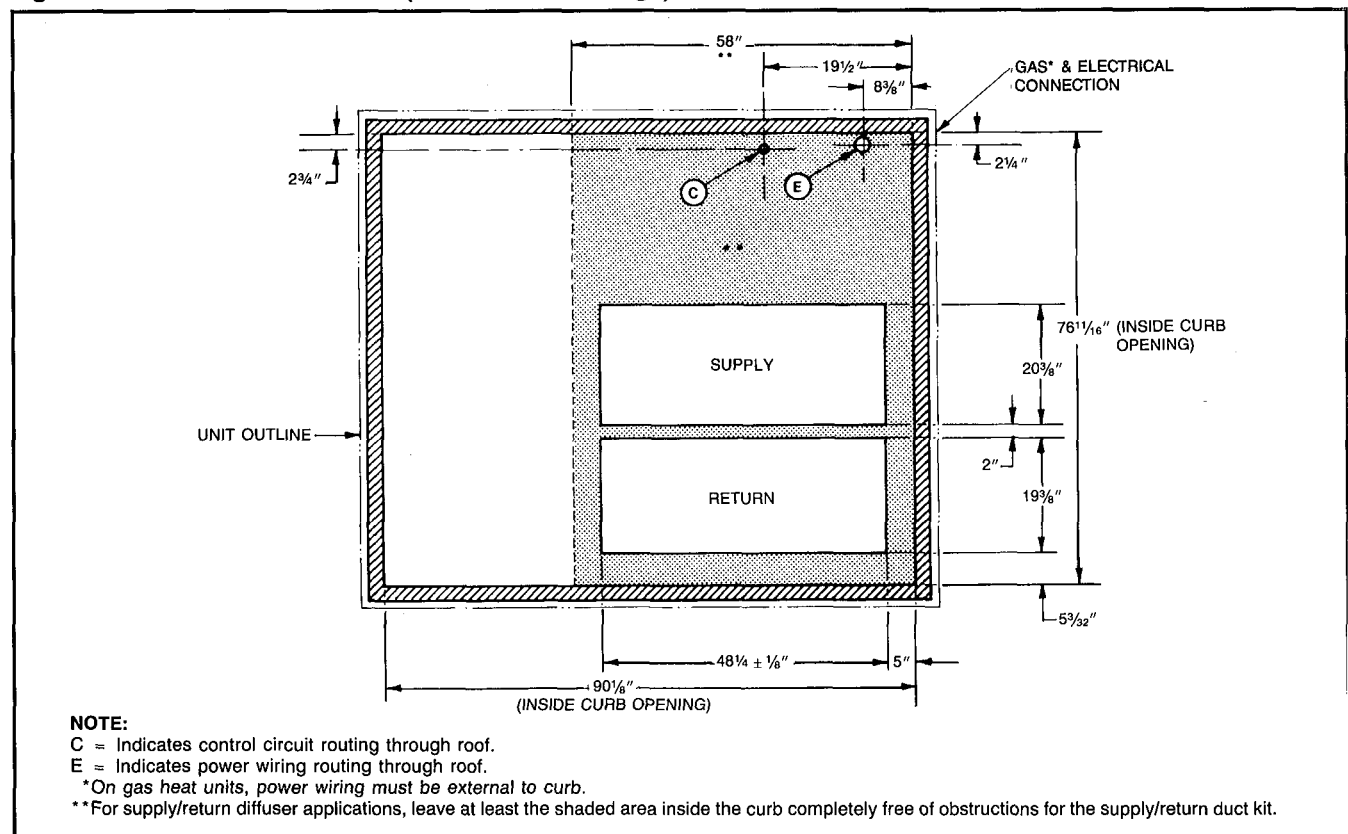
ACRB 1620 Roof Curb (Full Perimeter Design)
